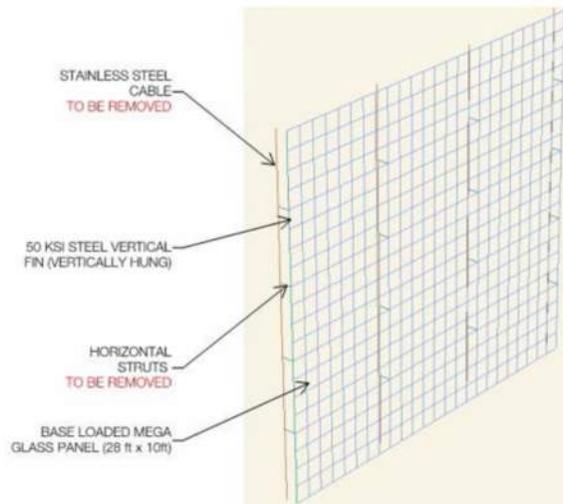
Façade System Modified Model with Glass Lites Supported by Vertical Fins – No Cables and Horizontal Struts
